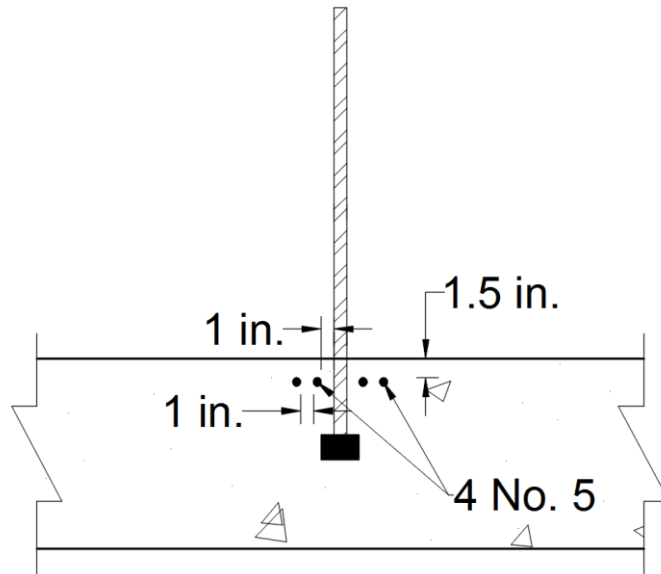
Cross-section view of shallow embedment specimen with 4 No. 5 bars as flexural reinforcement.
